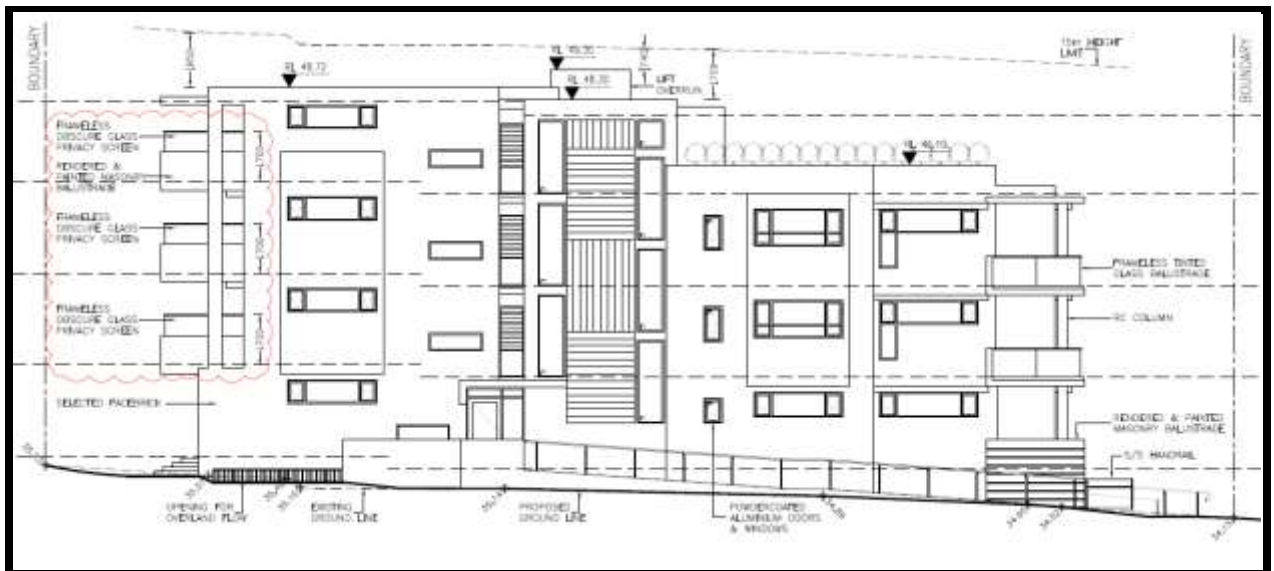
Amended north western elevation Issue E (Courtesy: Cornerstone, July 2021)
